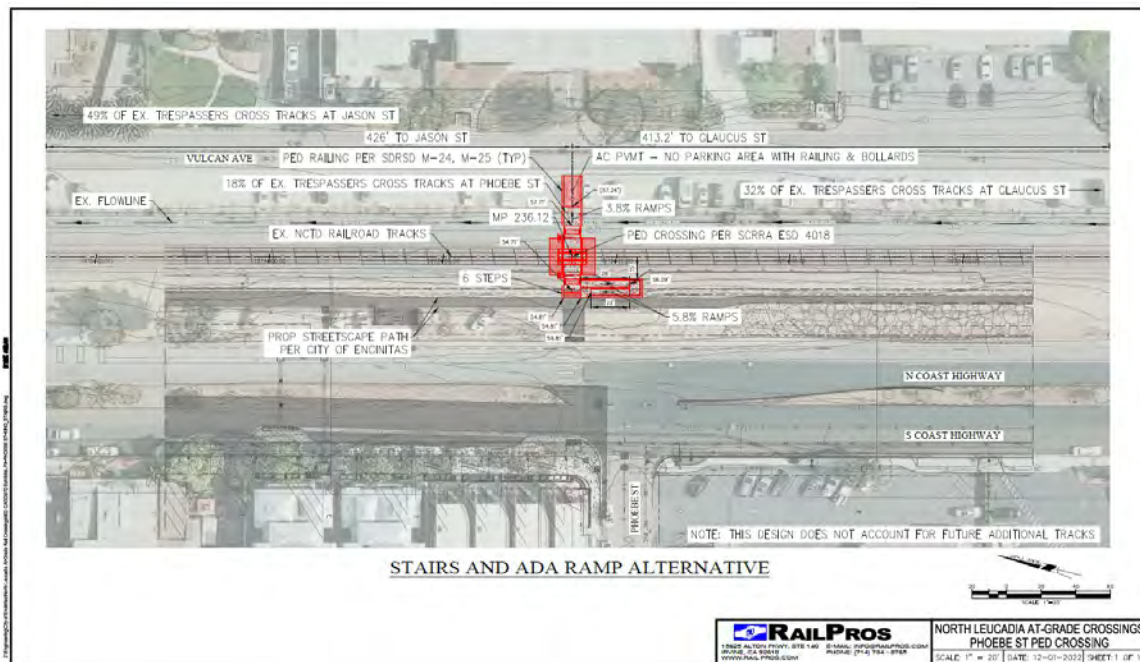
Phoebe Street Crossing Stair and Ramp Alternative
